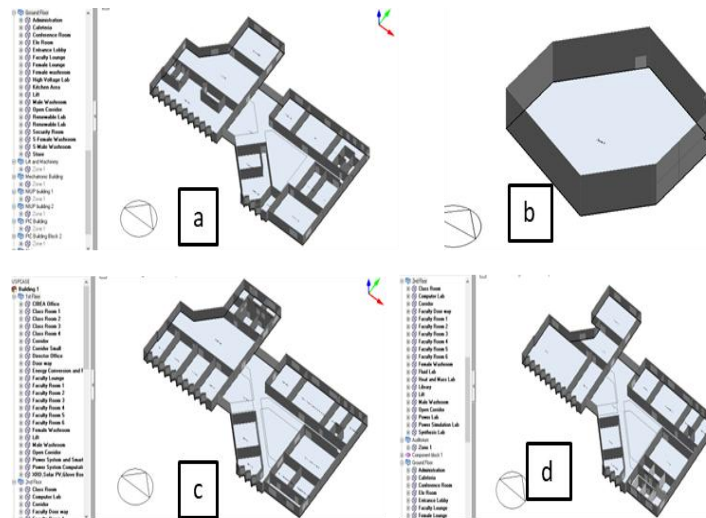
Composite layout showing the Ground Floor (A), First Floor (B), and Second Floor (C) plans for case study building.
